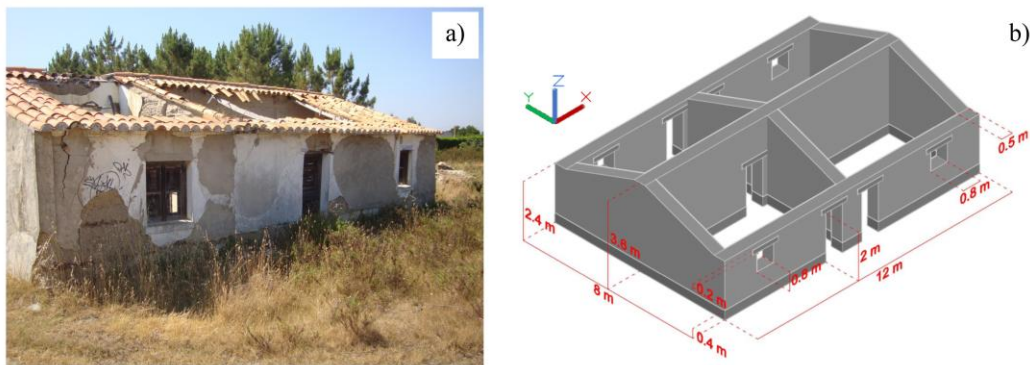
Rammed earth building: a) typical rammed earth dwelling from Portugal; b) geometry of the model
